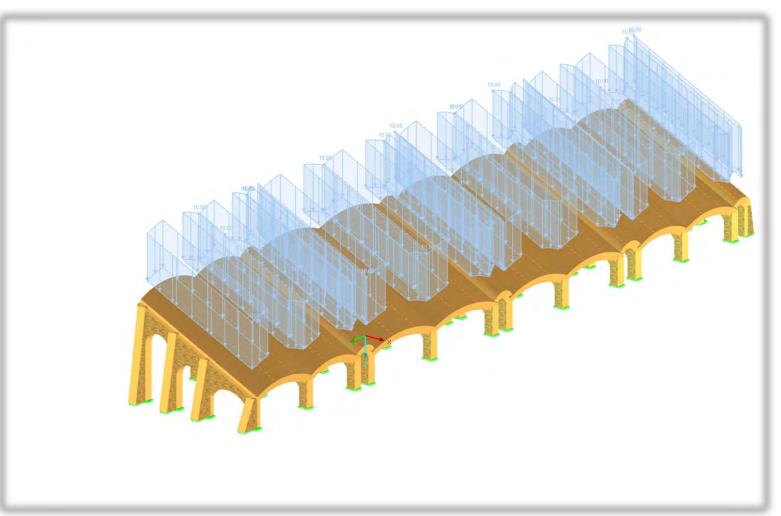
Assign of stone masonry fill loads on the arched slab (KN-M² Units)
